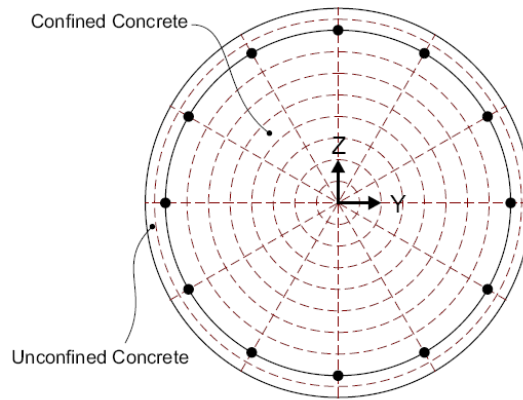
Sample fiber section for a reinforced concrete column with twelve longitudinal reinforcing rebars (OpenSees 2012).
